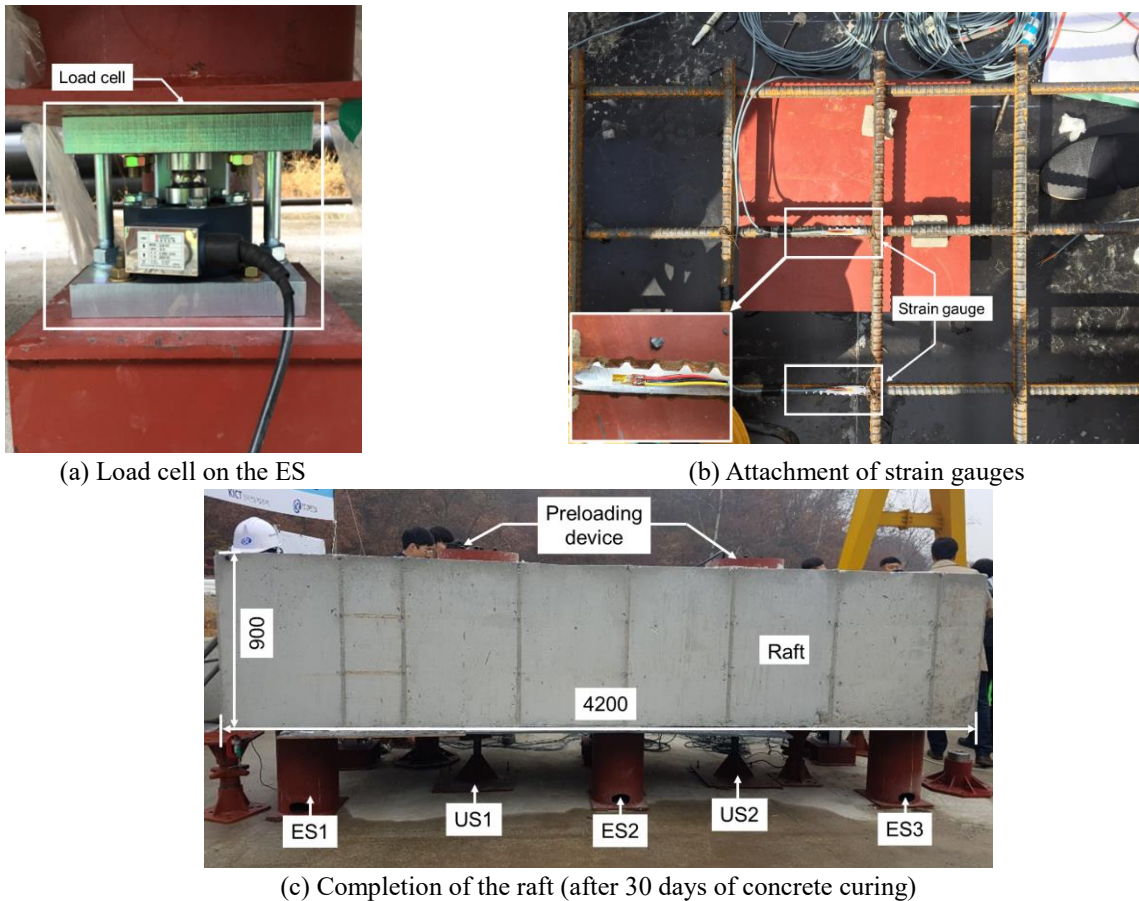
Instrumentation and construction of full-scale foundation structure model (unit: mm)
